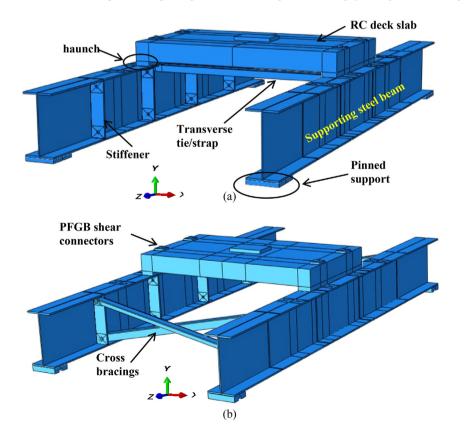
Outline of the deconstructable composite precast deck slab with external (a)ties/straps and (b)cross bracings in the transverse direction tested by Moradi, Valipour [12].
